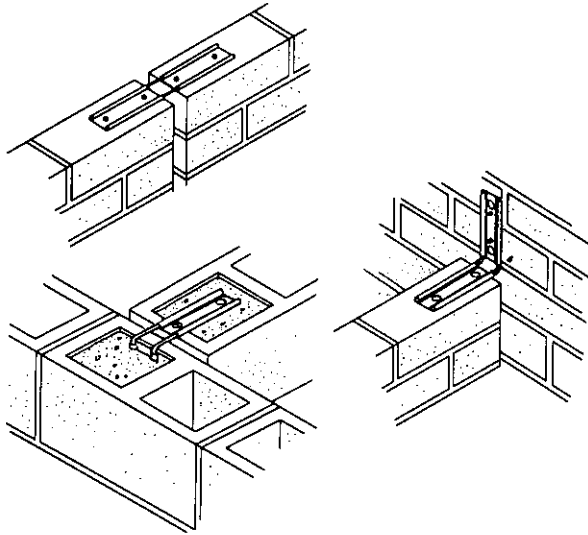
illustrates joint stabilizing anchors designed to allow movement at joints while maintaining wall alignment perpendicular to wall movement. These anchors are also adaptable for attaching concrete masonry walls to wood, steel, or concrete framing.
